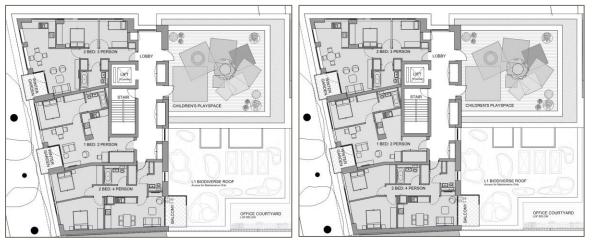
Sixth floor (left; seventh and eighth floor are similar) and ninth floor (right)
